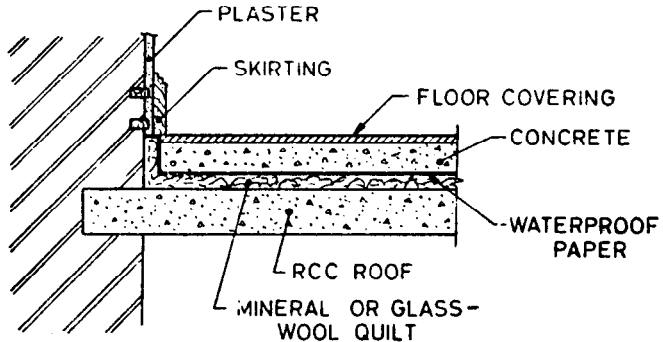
CONCRETE FLOOR FLOATING CONSTRUCTION
